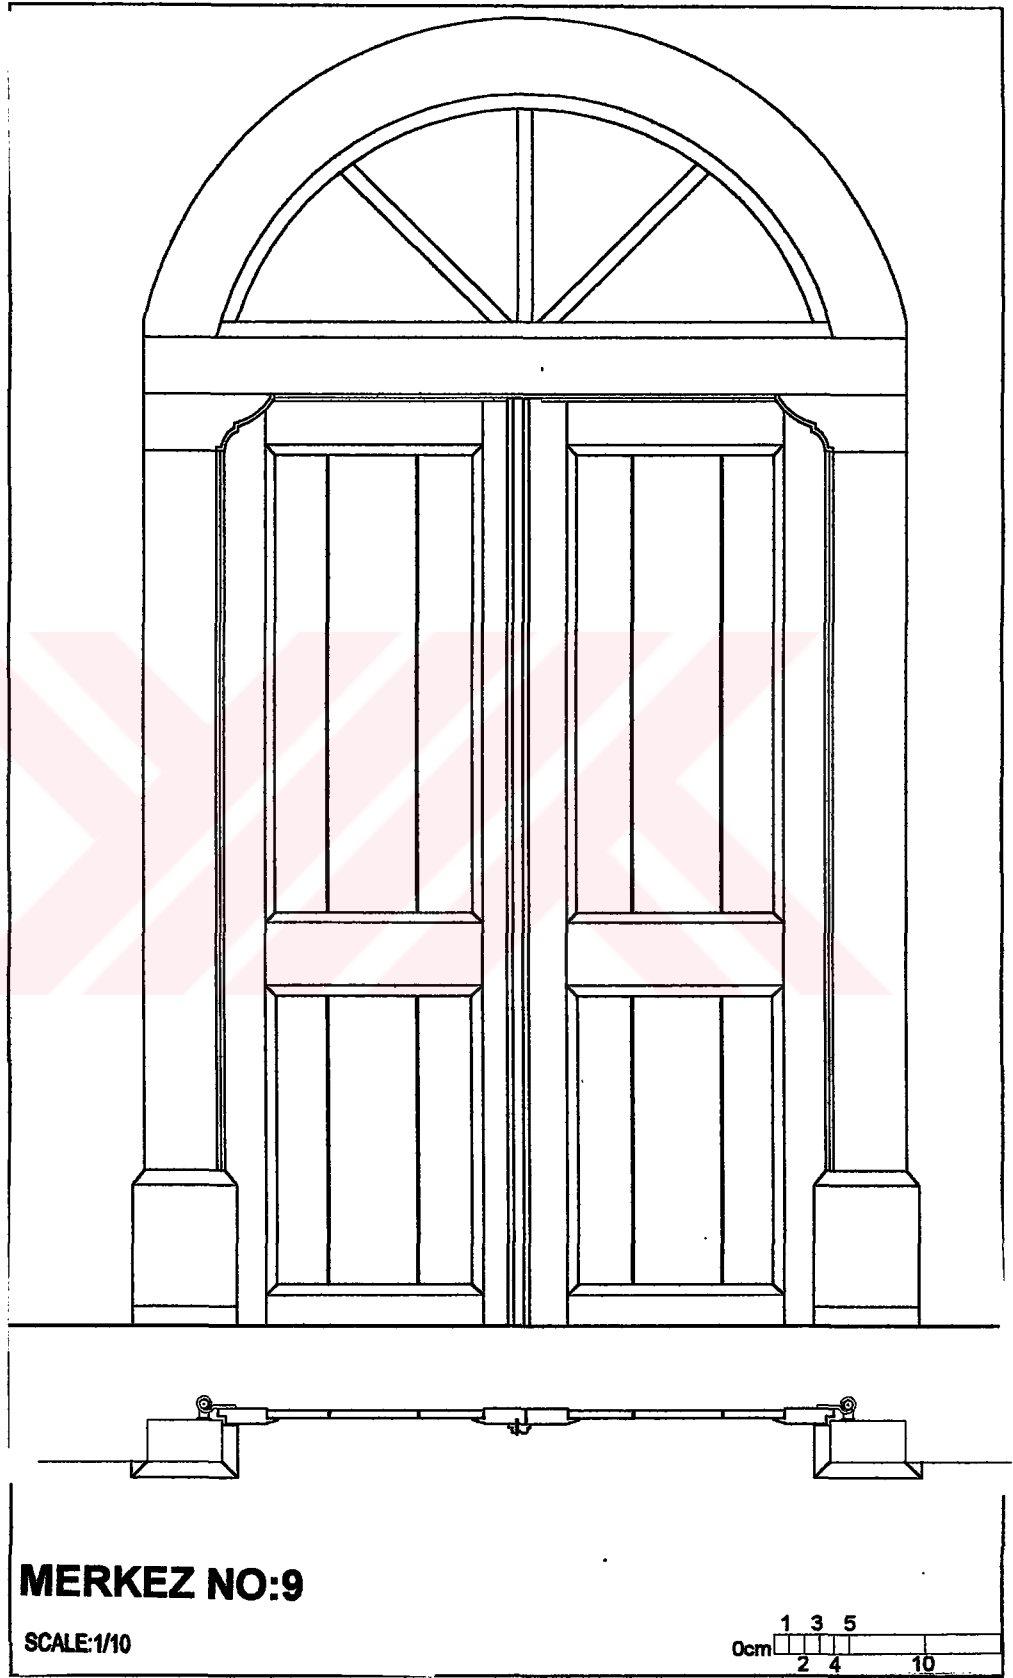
DW03 Merkez Caddesi No:9 Exterior Elevation and Plan
